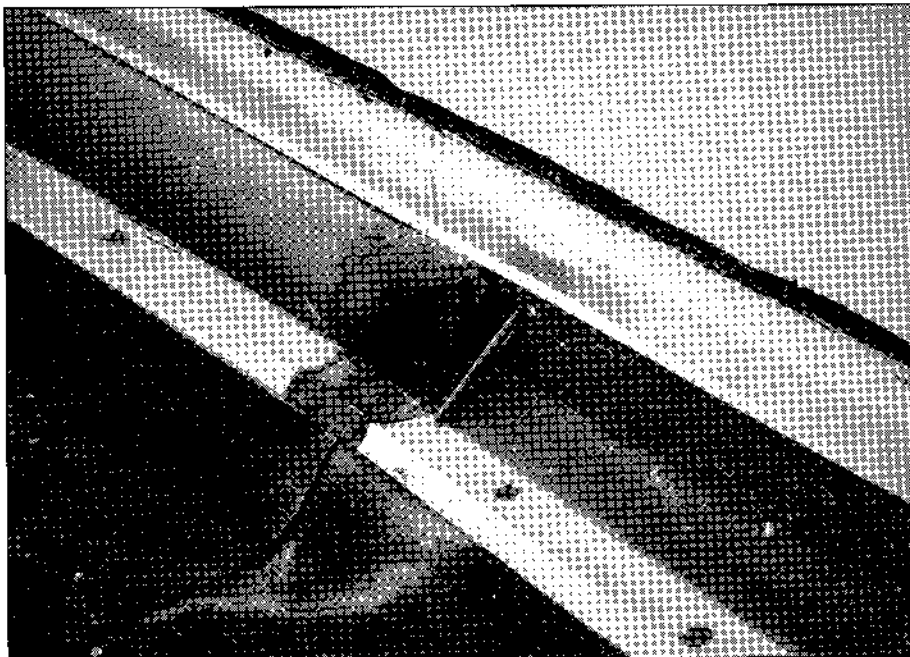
Roof 64B: The joint at the bellows of the expansion joint cover has failed. This appeared to be a material or workmanship failure. This six-year-old roof is located in New York.
